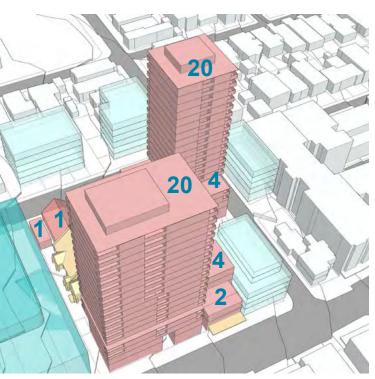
Perspective view: Planning Proposal with proposed building heights in storeys
